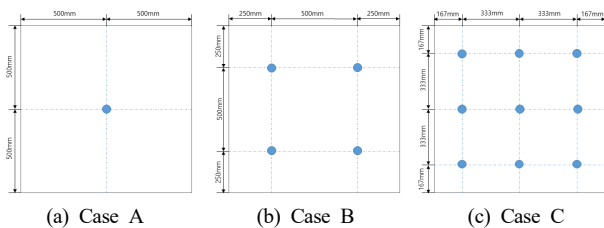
Conceptual diagram on installing point-type anchors with 1, 4 and 9 spots (● : anchor installation spot)
